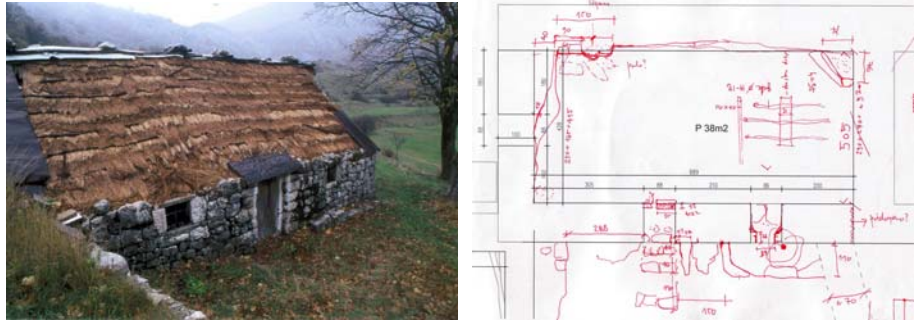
| Fieldwork – visit to the house which still have straw roofs, and sketches for architectural survey
